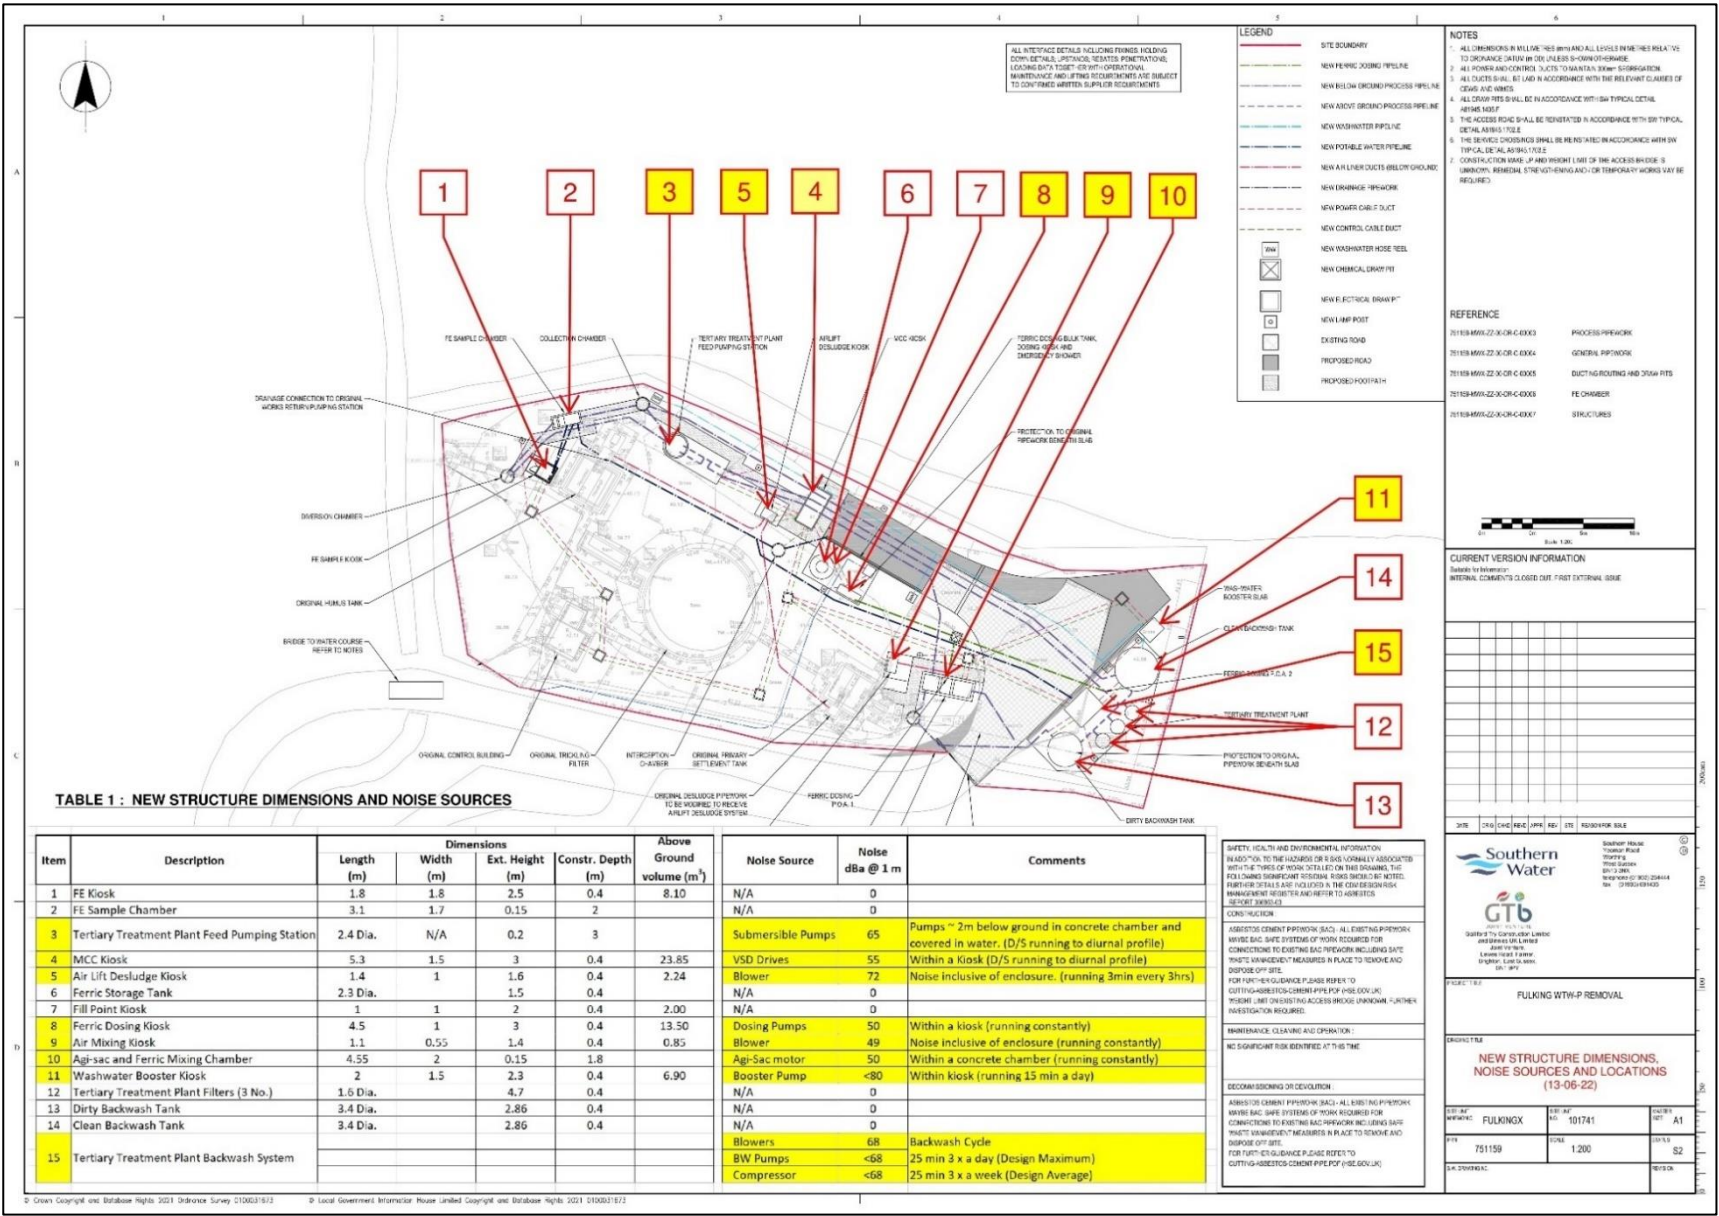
FULKING WATER TREATMENT WORKS – PROPOSED SITE LAYOUT
